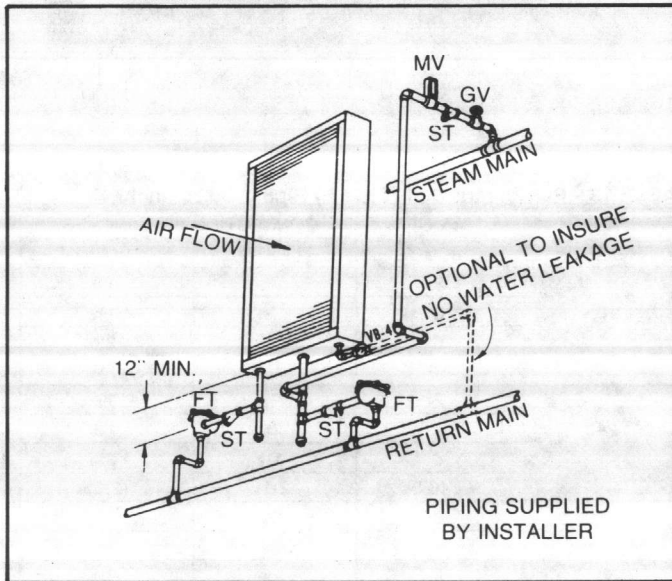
Typical Piping for Type NS Steam Coils and Vertical Tubes for Vertical Airflow
